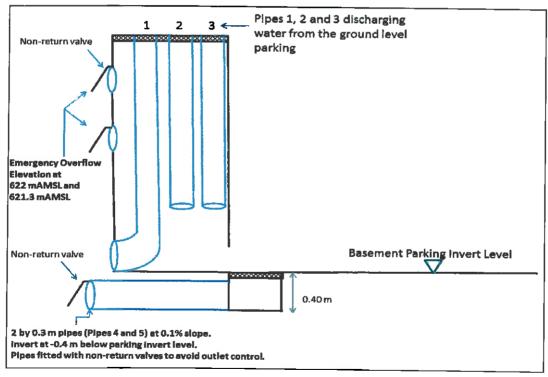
Conceptual Long Section Schematic of the Basement Level Sump, Catch Pit and Stormwater Diversion Pipes.
